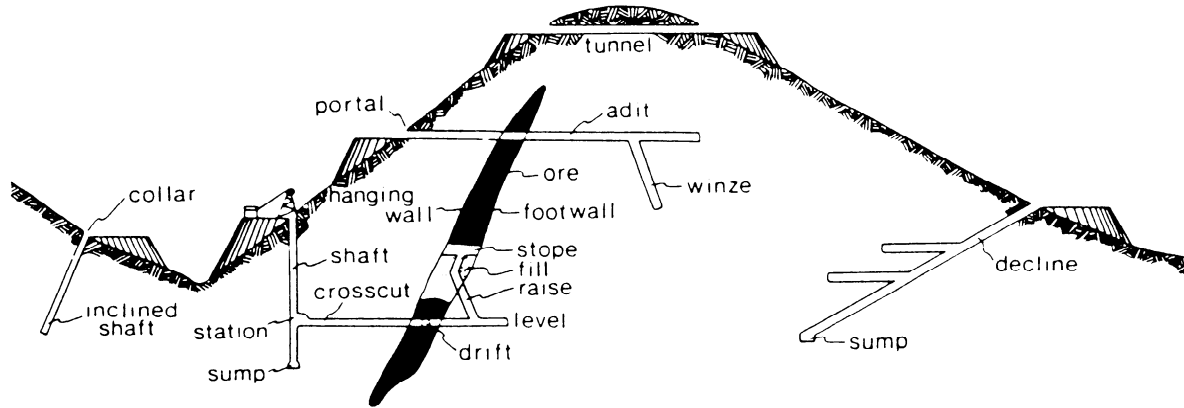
Underground mining, stoping method (Anon., 1983a).
